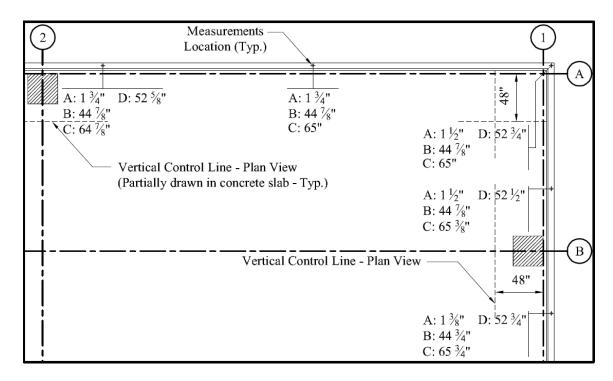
Example of data collected from 8th to 11th floor. Letters A, B, C and D denote de measurements gathered in the field according to the façade section showed in Figure 14. Partial floor plan (Typ.). Adapted from Dietzmann, J. M., Jr. (2014).
